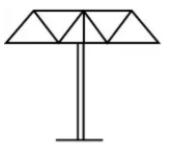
Sketch showing the column shape using vertical strut on column tops ¹³⁴
